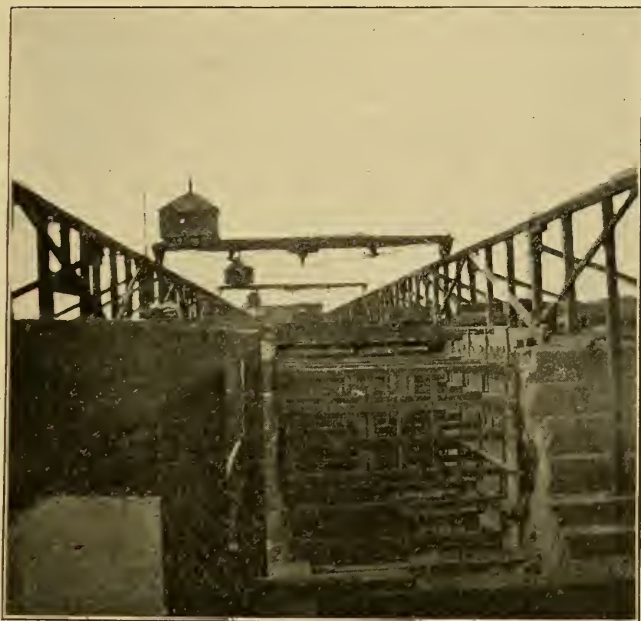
BUILDING NEW DOCK WALL IN TRENCH ACROSS OLD GRAVING DOCKS, LIVERPOOL.
